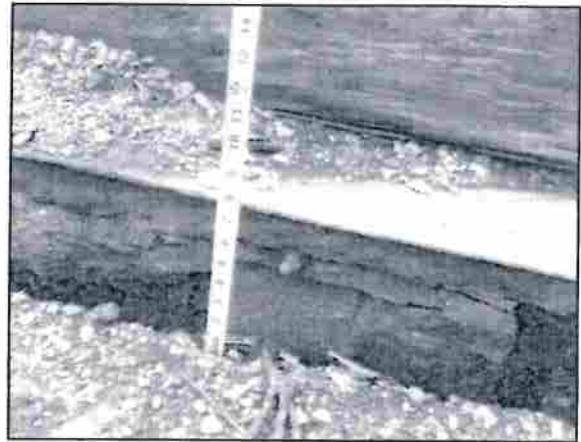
Approximately 7 inches of settlement at the back of the sheet pile wall (5/26/2019).
